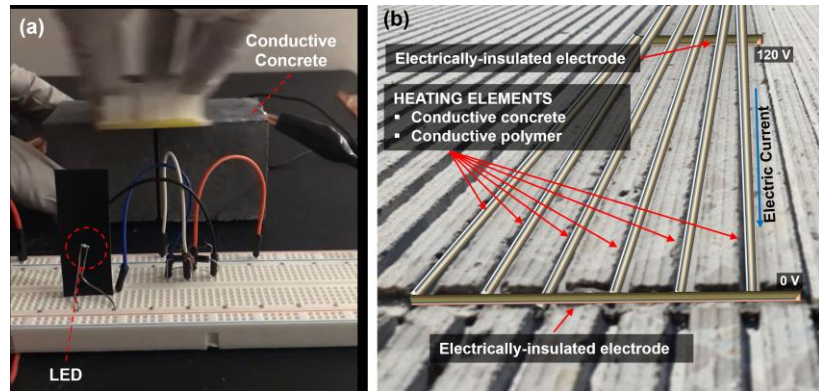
(a) Conductive concrete developed at Pitt powers an LED [14]. (b) Vision for self-heating concrete pavement with surface-mounted heating elements partially filling the grooves.
